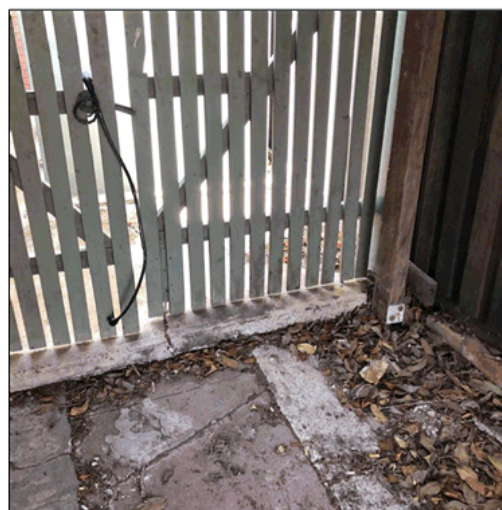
existing garage structure and 120mm impervious concrete path along southern boundary of the property
